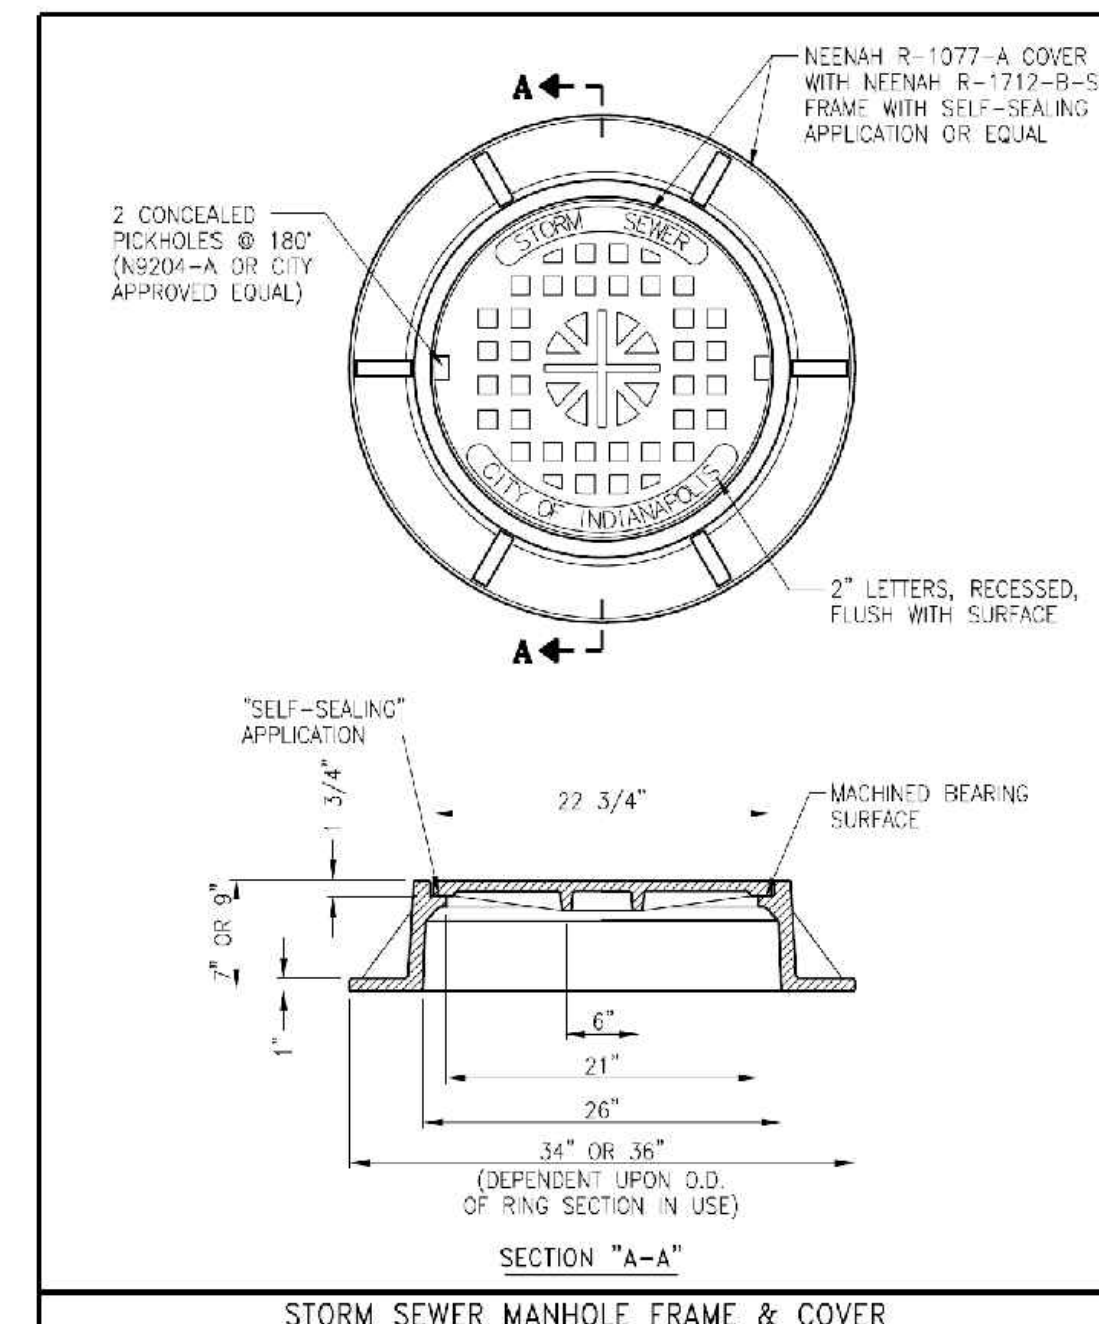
Storm Sewer Manhole Frame & Cover
